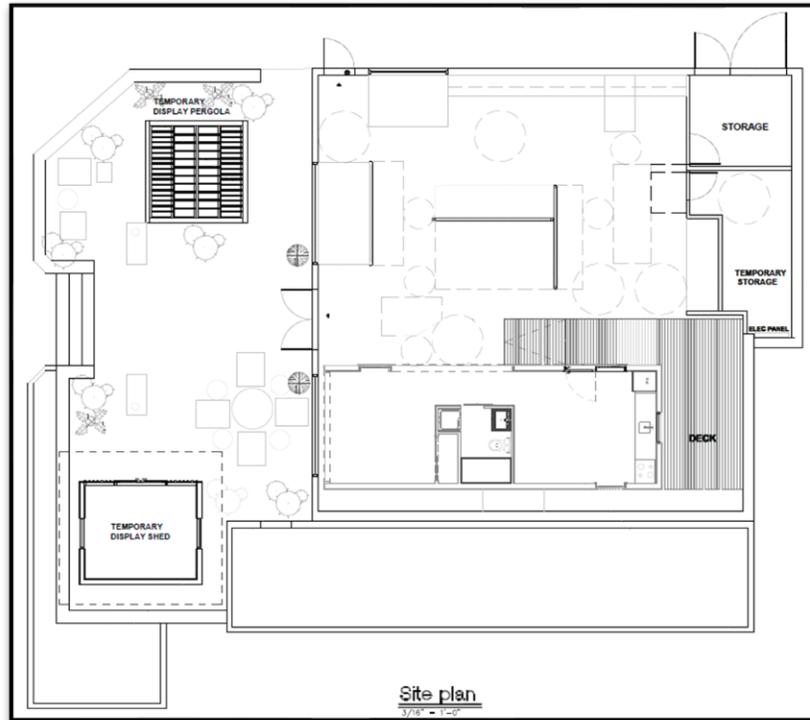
Temporary Display Shed – Project Plans, Attachment 2
